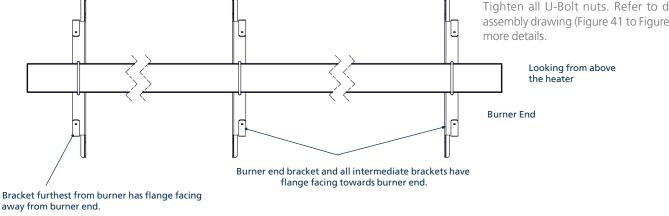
U-Bolt to U-Tube heater suspension brackets
